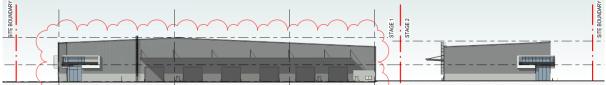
South Elevation - Rear of Site (Source: Watson Young Architects)
